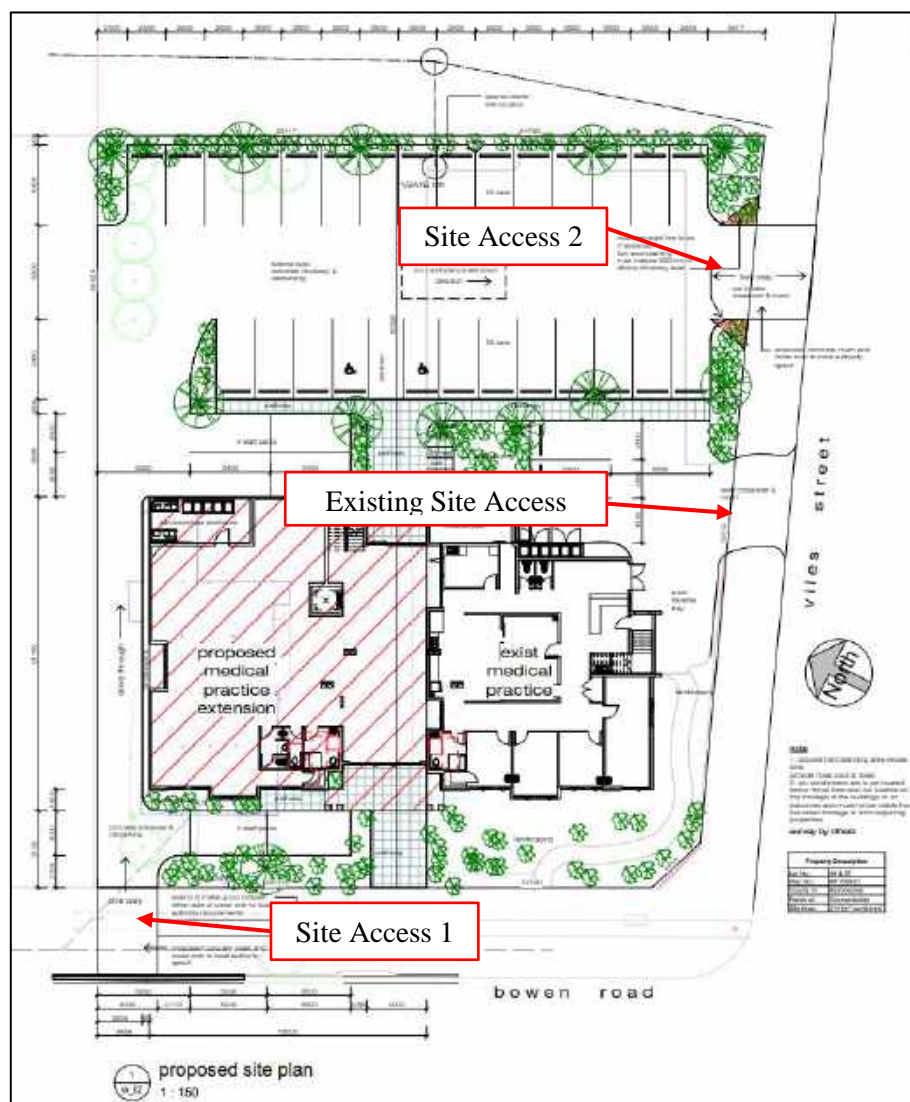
Proposed Site Plan (Source: Concepts Building Design)
